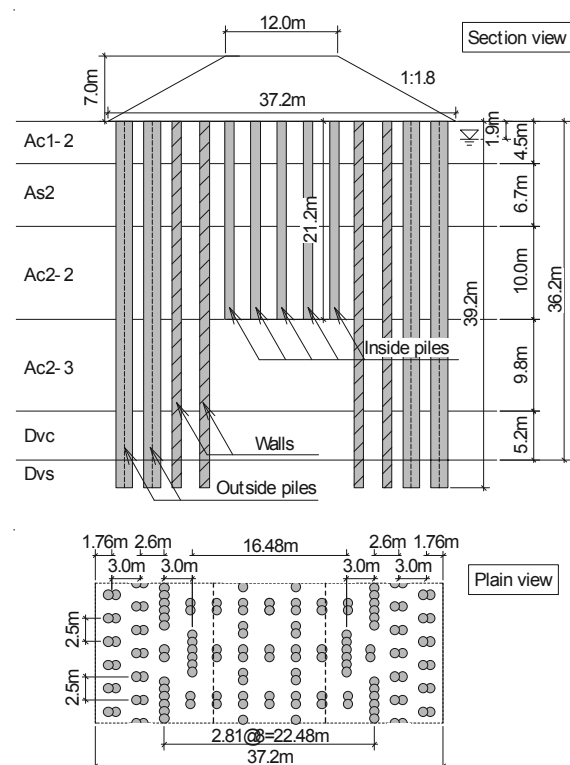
Geological profile and arrangement of the deep mixing columns and walls at the construction site where the method was applied.
